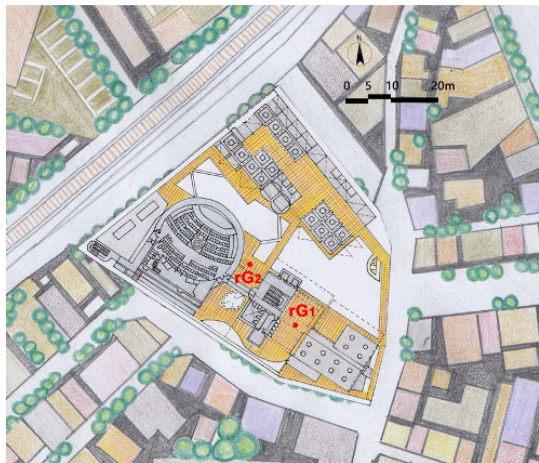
The rooftop garden (rG) in the south building. (Source from: drawing and photo from the author)
